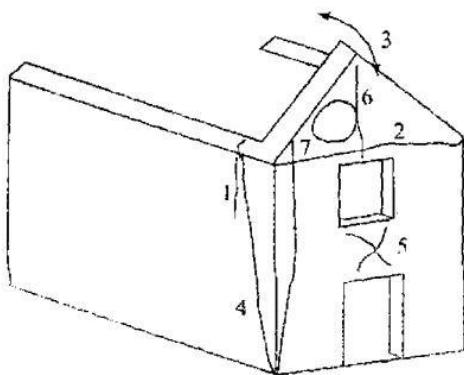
In-Plane failure characterization (pasquale and Orsmi, 1999)
